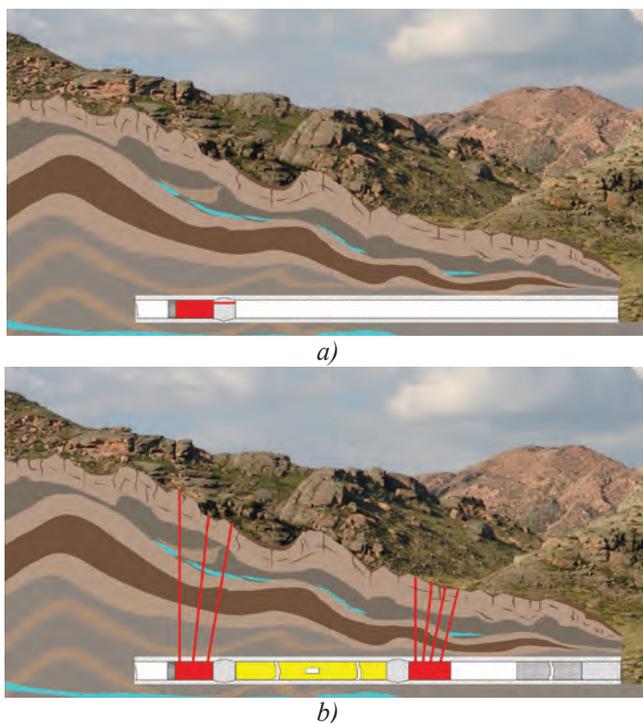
The horizontal (a) and vertical (b) methods for opening up tunnels
